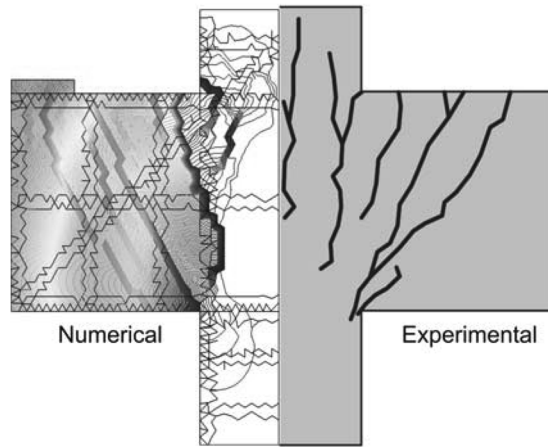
Reinforced concrete corbel. Crack patterns
